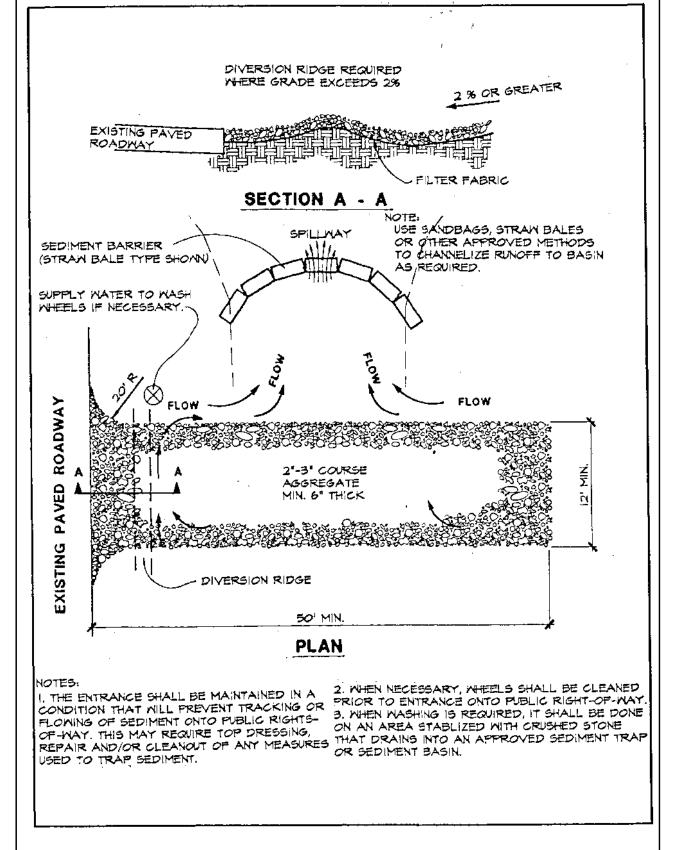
Temporary Gravel Construction Entrance Source: Erosion Draw
